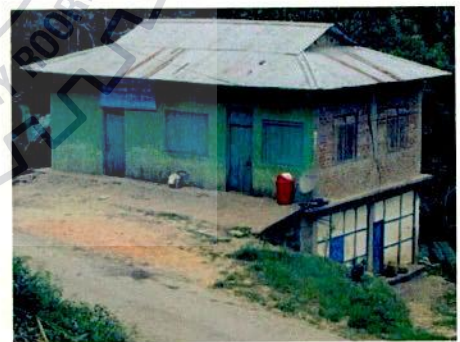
House in Sikkim, mixed construction of Ikara and URM
